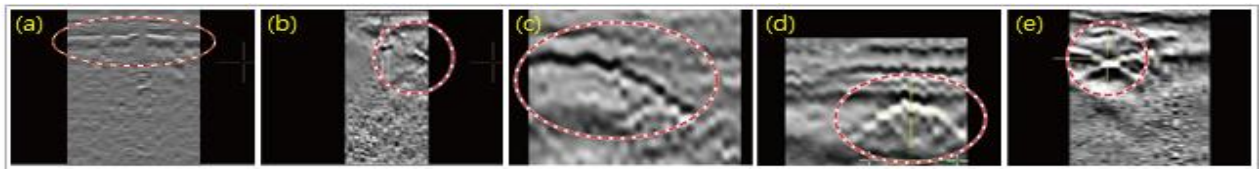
Cross section analysis - (a) Underground pipe, (b) Gravel layer, (c) Underground cavity, (d) Sand layer, (e) PE corrugated pipe
